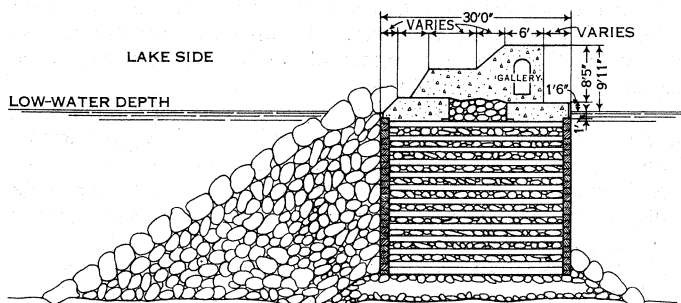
SECTION OF CONCRETE-CAPPED JETTY
